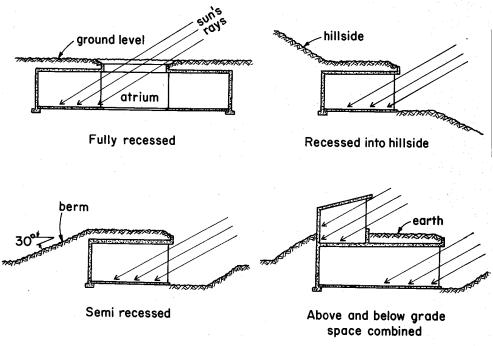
Typical configurations for various types of earth sheltered buildings.
